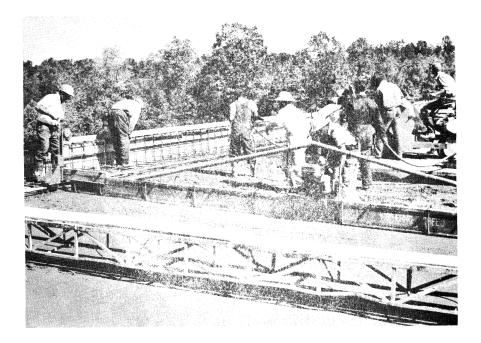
Transverse vibratory type screed which covers the full width of the deck and is propelled by reel and cable. Note work bridge in foreground.
